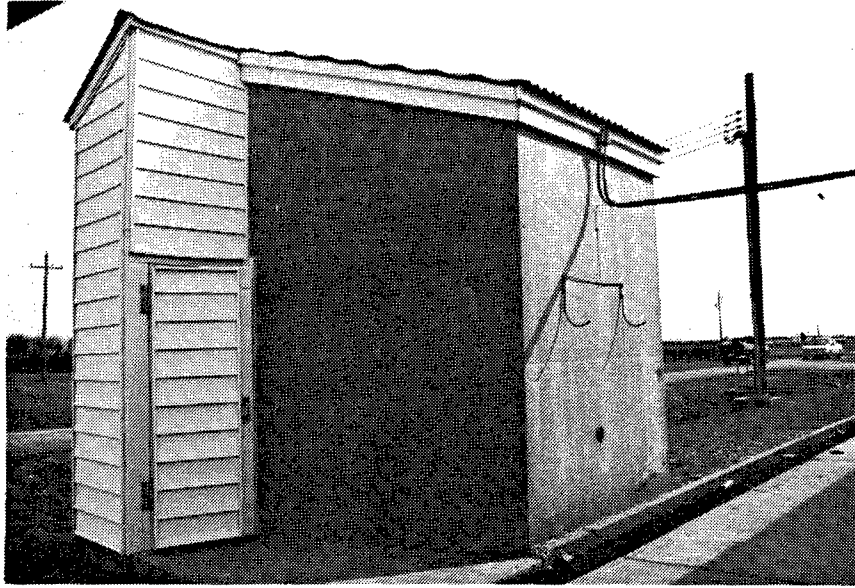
Building 540: This Metal Parts Loading Building served as a Vacuum Building.
